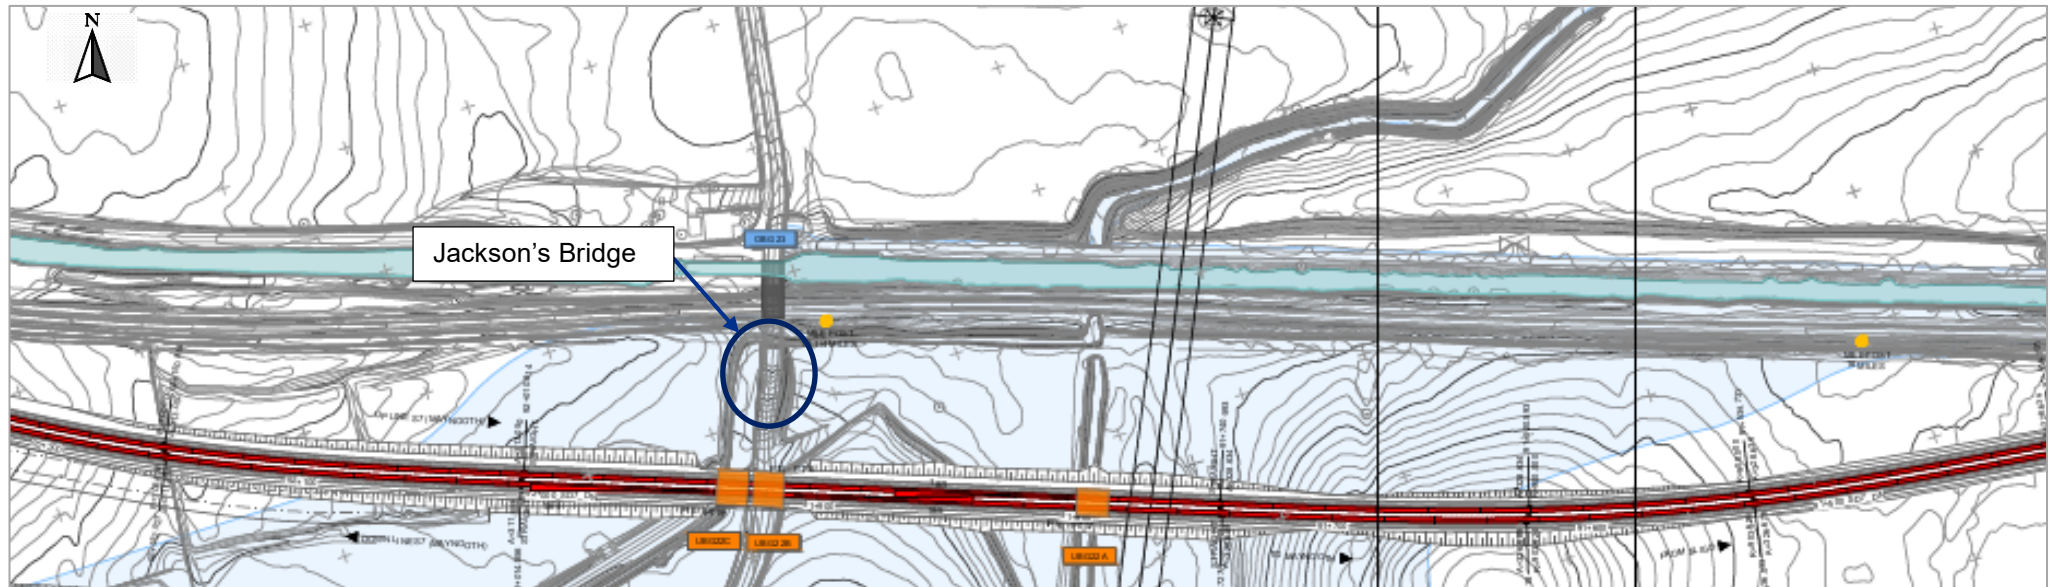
Alignment of Diverted Track to the South of Jackson's Bridge
